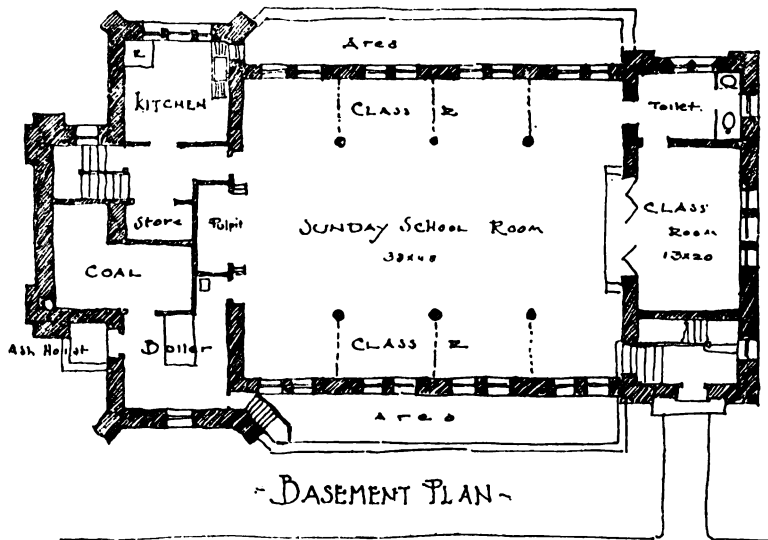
CHURCH AT KATONAH AVENUE, NEW YORK CITY—BASEMENT PLAN.
